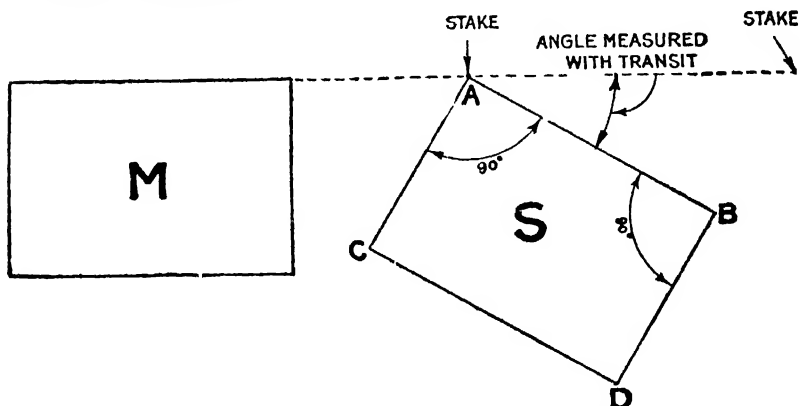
Method of laying out a new building S at a given angle with an old building M. After the corner and the direction of one wall are determined, a right angle may be laid off (if the building be rectangular) thus locating two of the sides, as AB and AC. The length of the side AB is now measured, locating the corner B. The transit is set up at B, and the line BD, laid off at right angles to AB, AC, and BD, are then laid off the proper length, and thus the four corners of the building located. If the building had not been rectangular the proper angles could have been laid off instead of right angles. It is often desirable to make a block plan or map of the grounds and buildings of a plant.
